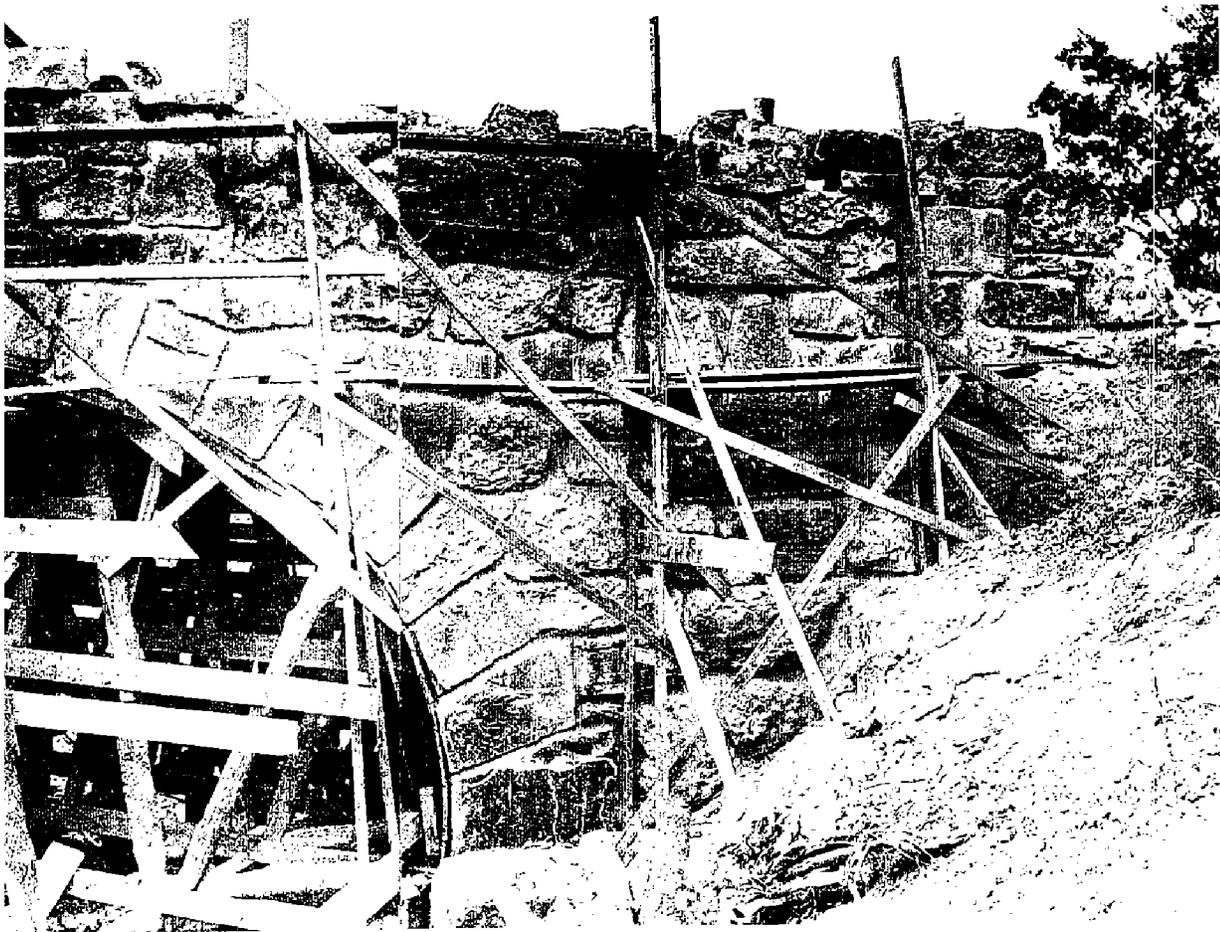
Construction of the foundation for Tucker Tower. (Photograph from the collection of
